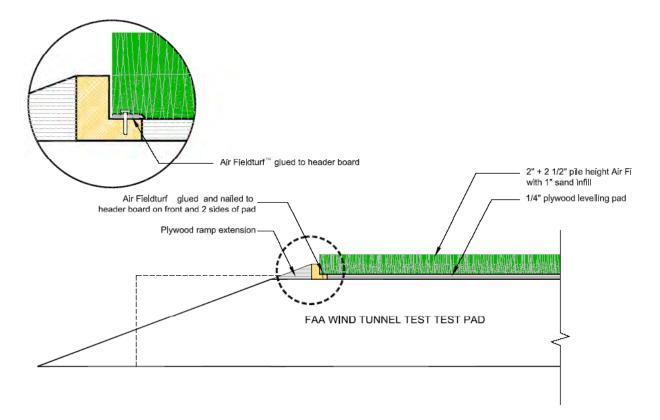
AIR FIELDTURF ENGINEERING DRAWING FROM WIND TUNNEL 2.0-INCH FIBER
